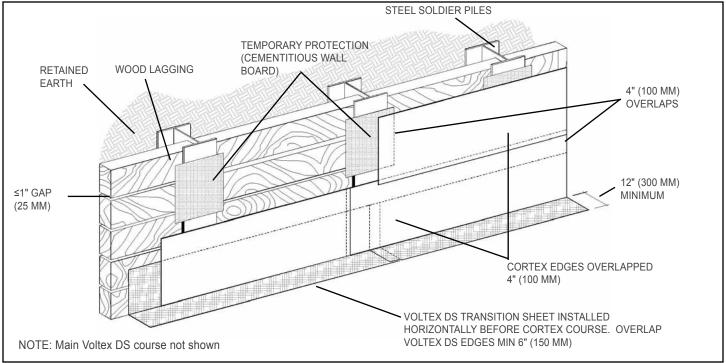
CORTEX INSTALLED ONTO SHORING WALL PRIOR TO VOLTEX DS
